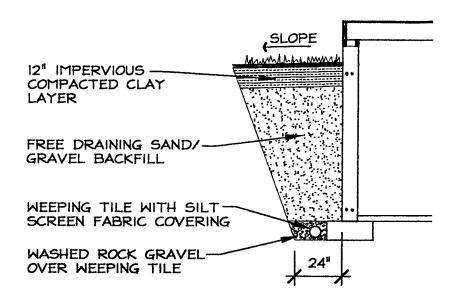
RECOMMENDED BACKFILL SYSTEM
